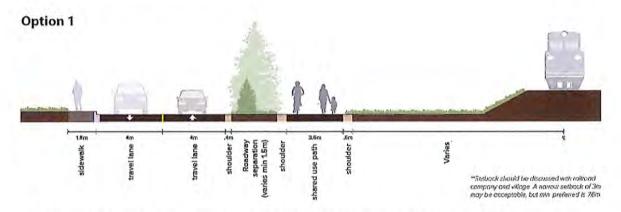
Option 1 shows a cross section of shared use path setback from the roadway.
